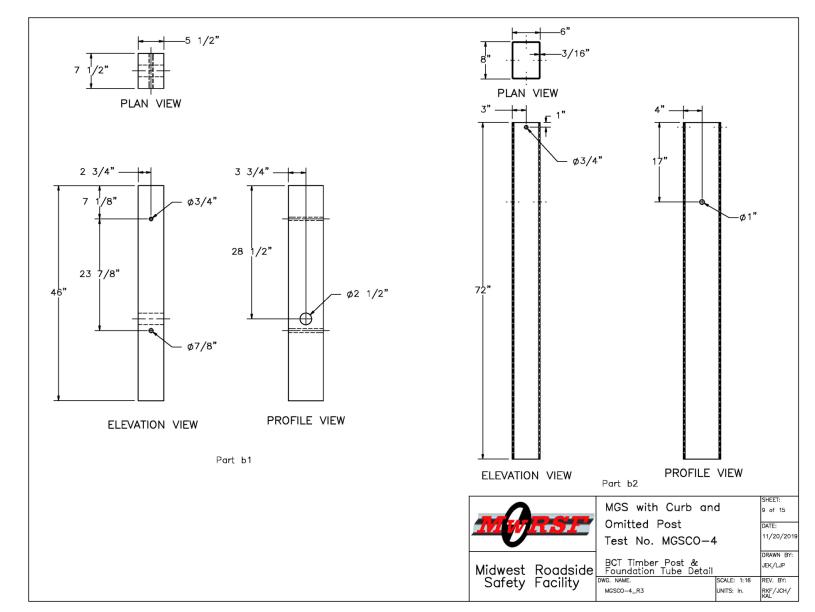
MGS BCT Timber Post and Foundation Tube Details, Test No. MGSCO-4
